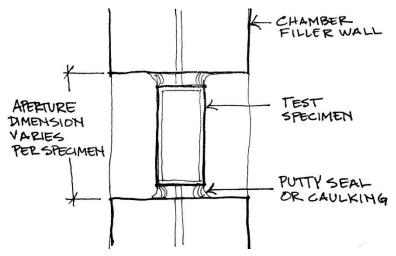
BASIC SETUP OF THE TEST SPECIMEN LOCATED IN THE TEST CHAMBER FILLER WALL.
